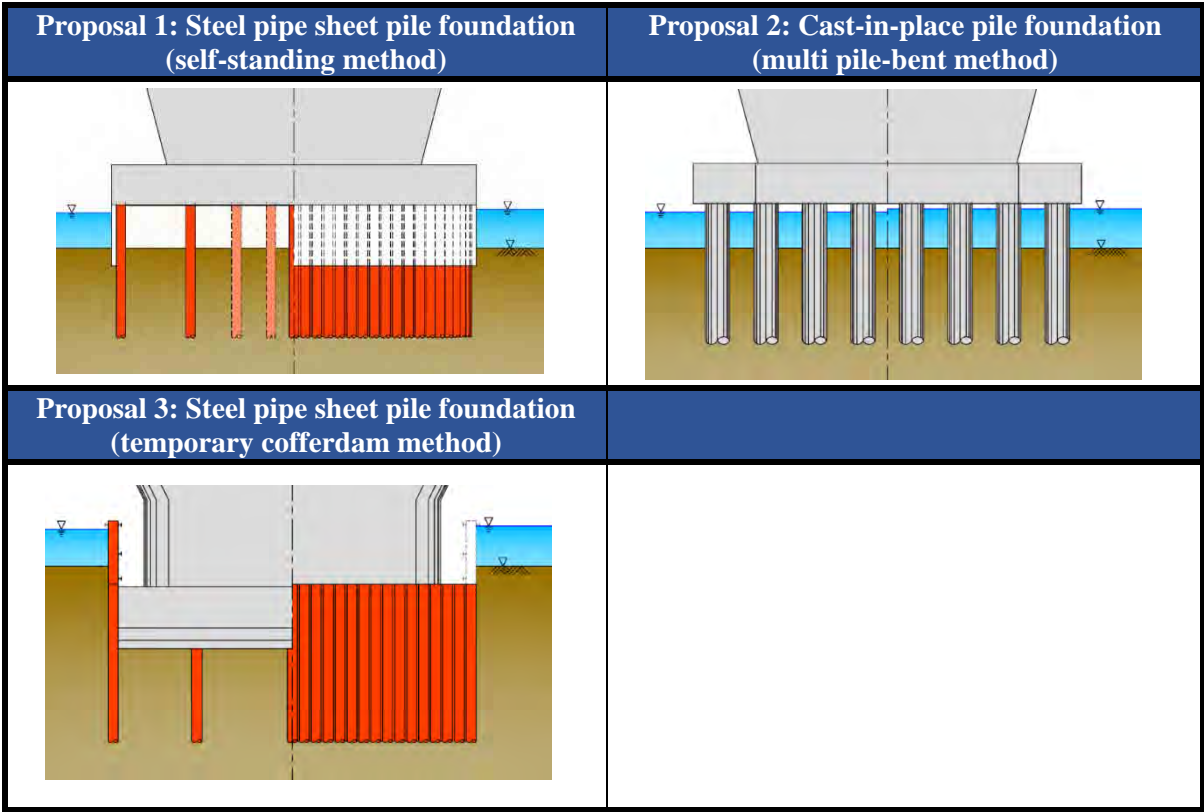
Structure of Foundations for Left Bank Main Bridge Main Tower
